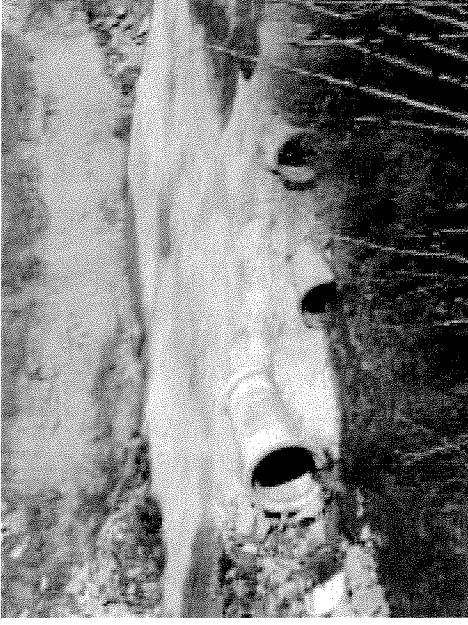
Cross-view of Hogan Low-flow Road Crossing culvert inlets
